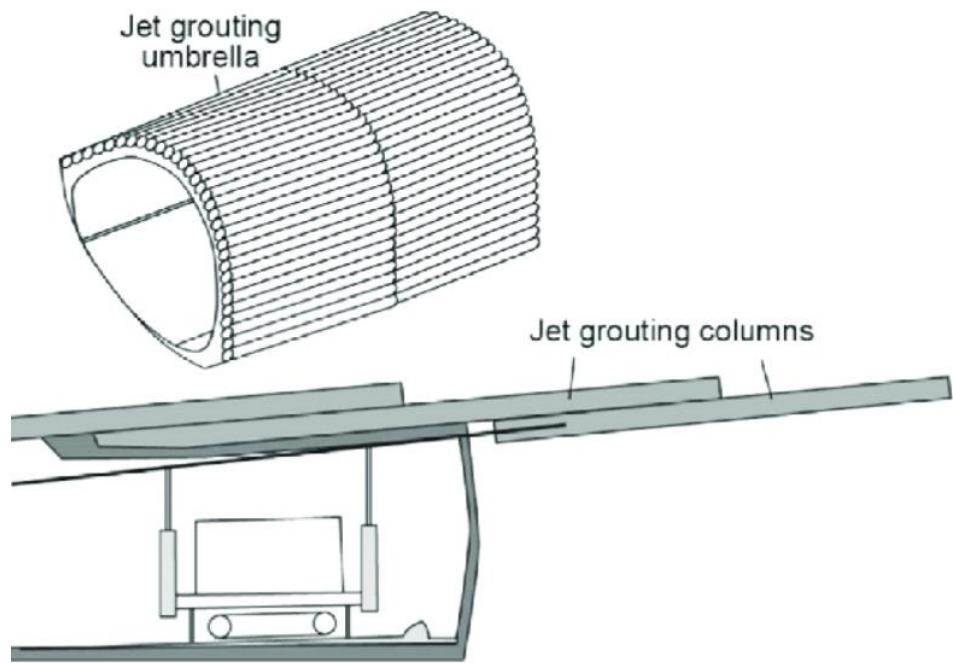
Reinforcement of ground in a tunnel with subhorizontal jet grouting umbrellas (source ResearchGate)
